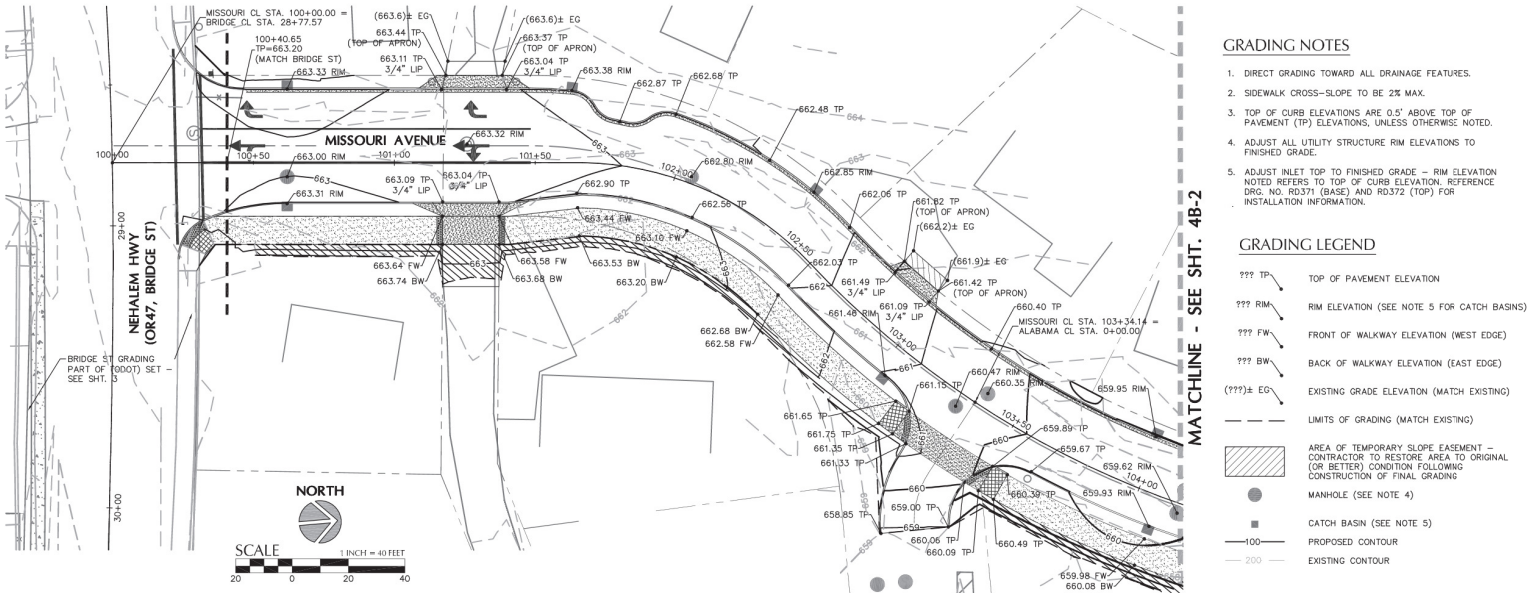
A detailed grading plan for a public utility and roadway improvement project.
